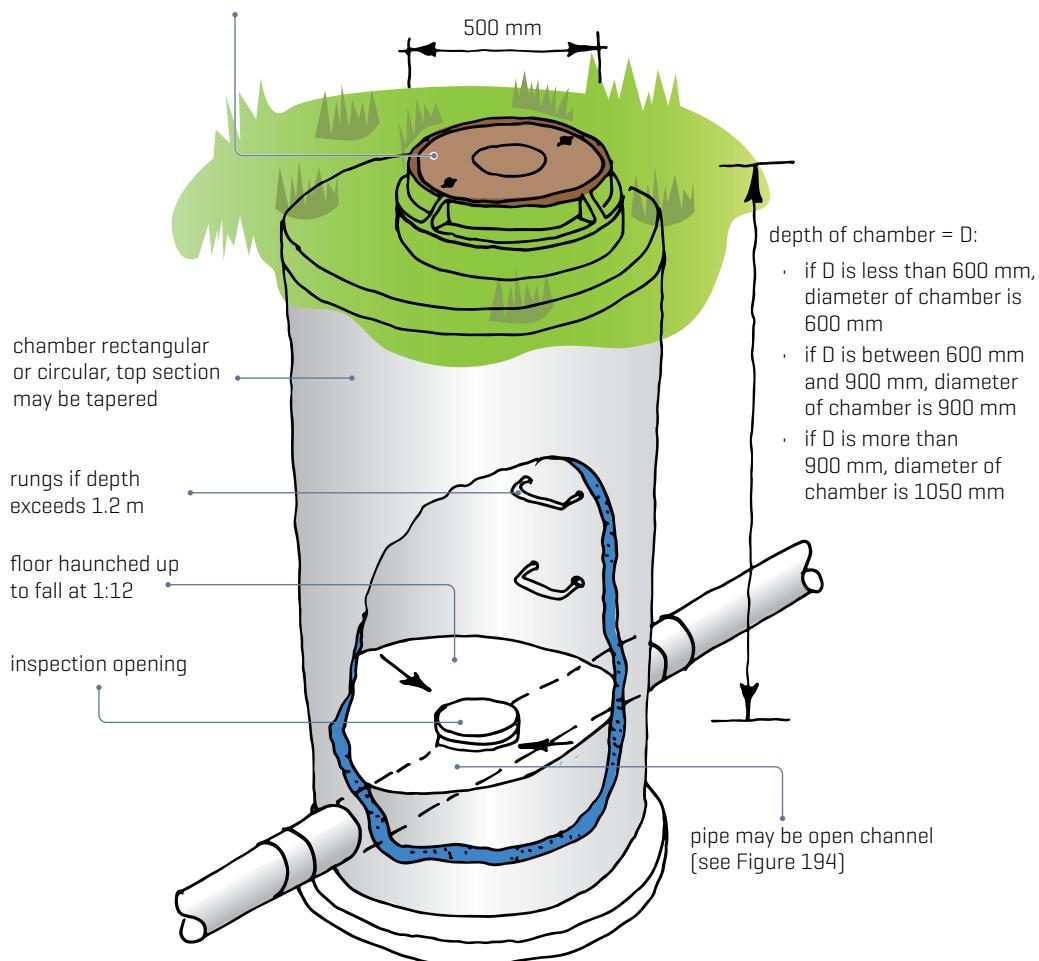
Inspection chamber with enclosed drain and inspection opening.
